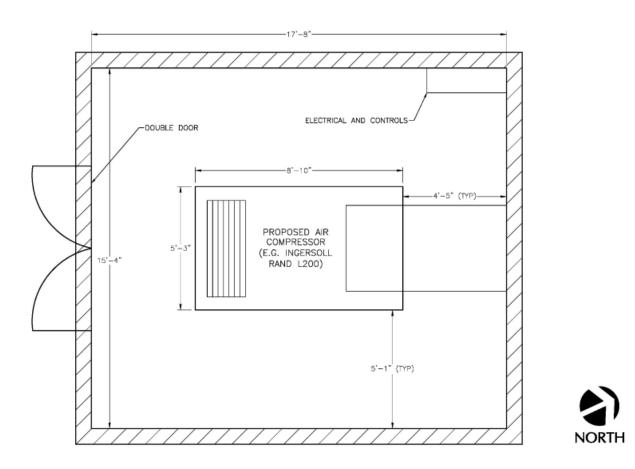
Conceptual Building Plan for Expanding the Existing System.
